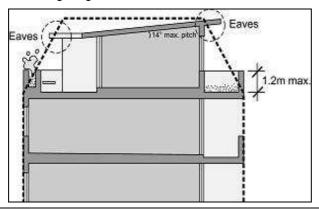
Part additional floor: Eaves may project beyond the building envelope by up to 1m.
